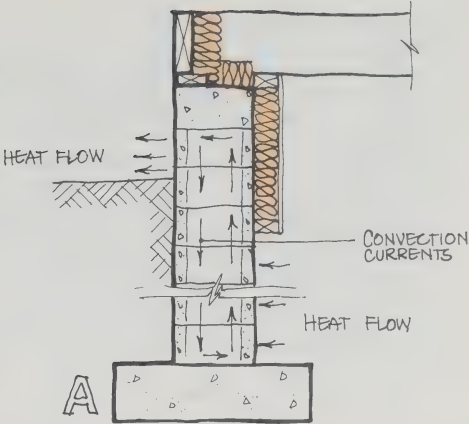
INSULATION OF HOLLOW MASONRY WALLS.
